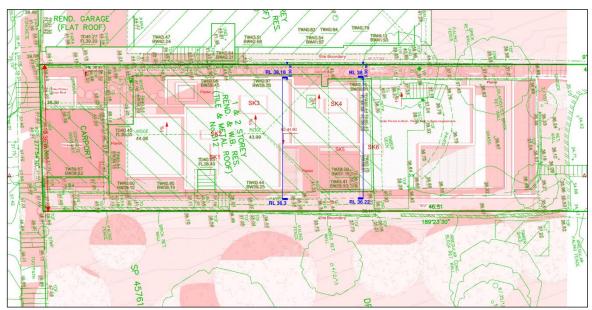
Overlay of submitted survey and roof plan marked up by Assessment Officer to create sectional diagrams of side setback non-compliance.
